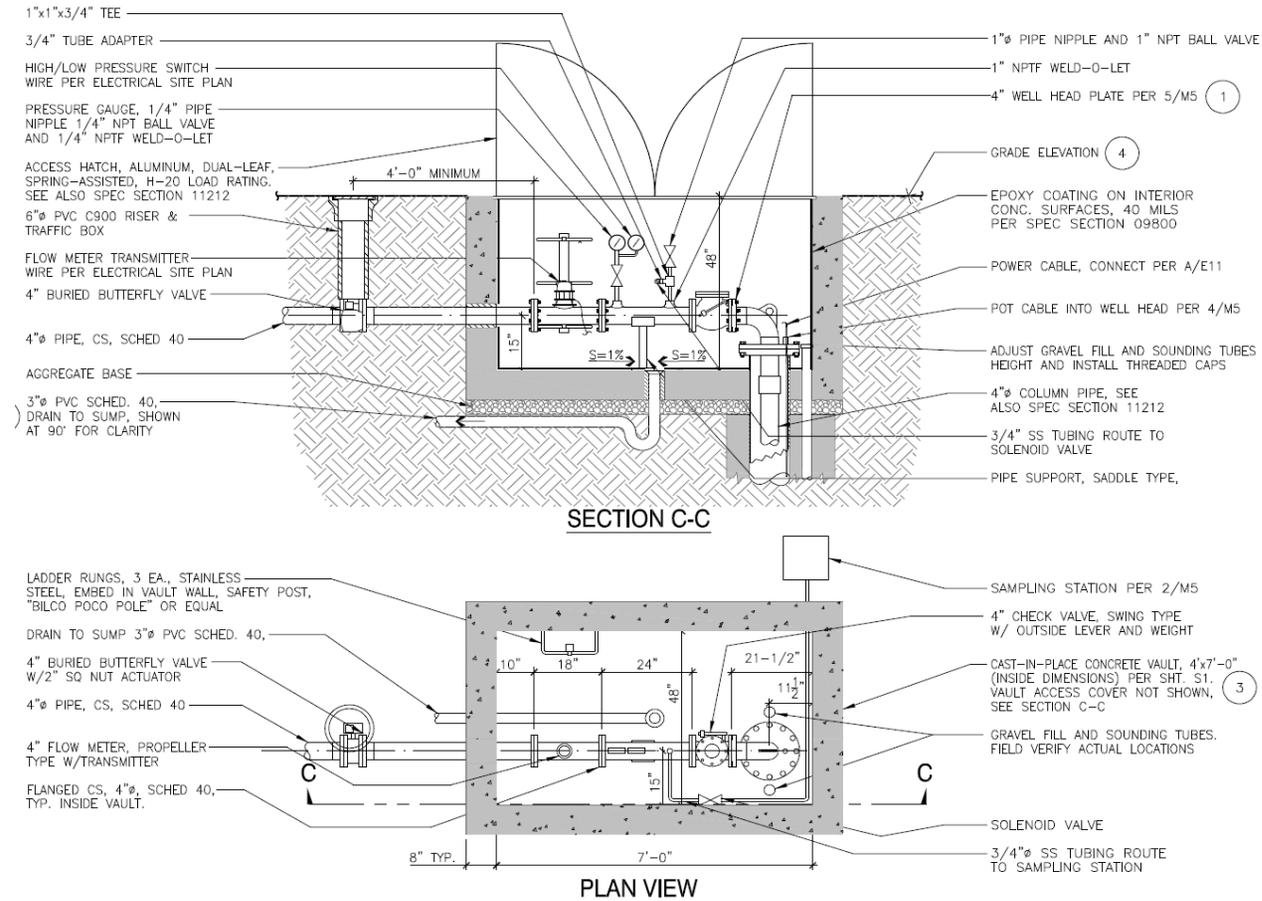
SECTION AND PLAN VIEWS, WELL 4695
